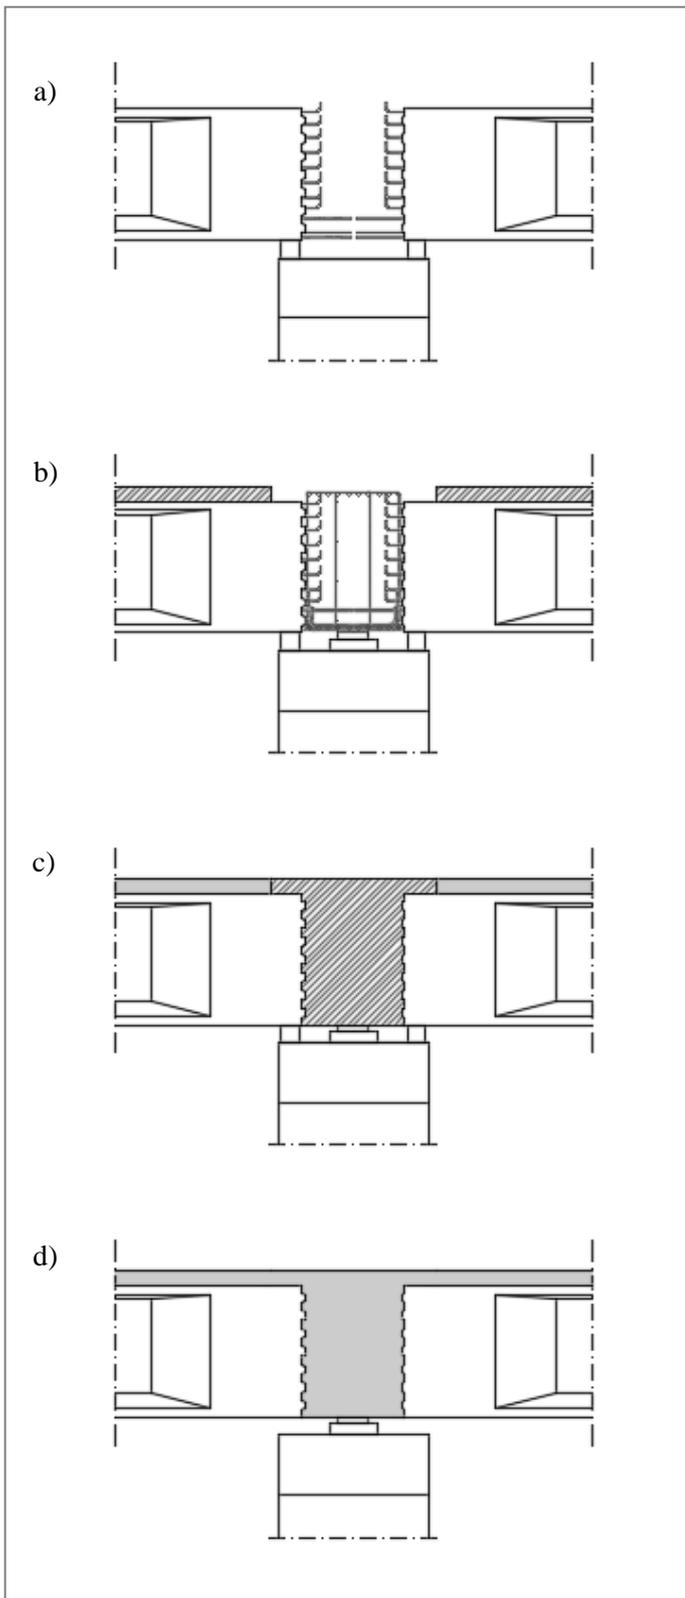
Construction stages: a) placement of precast girders over temporary supports located on pier heads and abutments, b) placement of slab's reinforcement and casting of deck slab, and placement of pier transverse diaphragm's reinforcement, c) realisation of pier transverse diaphragm, d) removing of temporary supports / Costruzione per fasi: a) posizionamento delle travi prefabbricate su appoggi temporanei ubicati sulle pile e sulle spalle, b) posizionamento dell'armatura della soletta e getto della soletta, e posizionamento dell'armatura del traverso di pila, c) realizzazione del traverso di pila, d) rimozione dei supporti temporanei.
